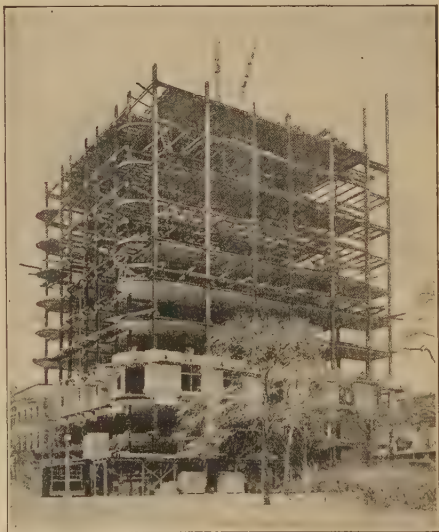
A building in process of construction showing the structural steel. (Courtesy, American Bridge Company.)
